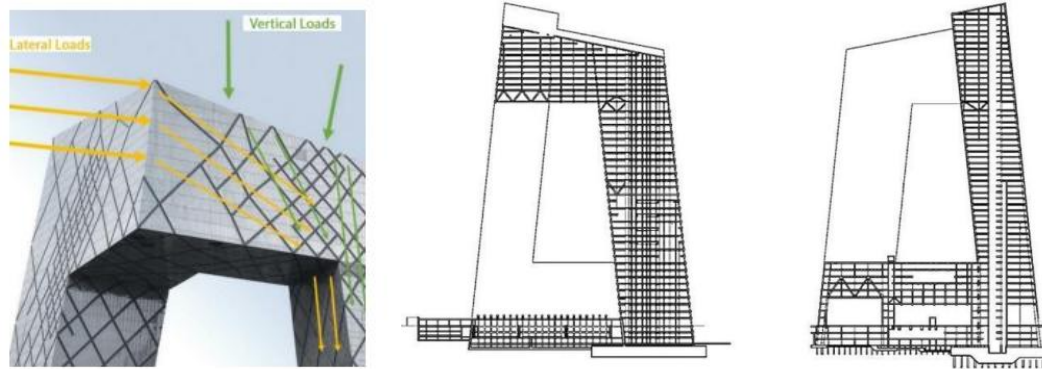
Left: Load Transfer via diagrid system Right: Sections through the building showing vertical internal structure and transfer trusses
